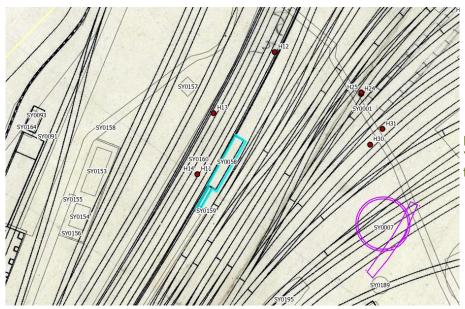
1896 plan of Sydney Yard showing the extended footbridge. Source: SLNSW.
